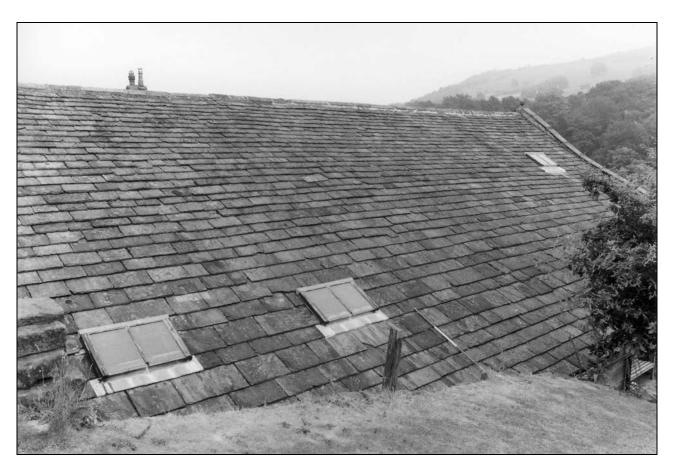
The barn's southern roof pitch, from the south-west (film 1, frame 8)
